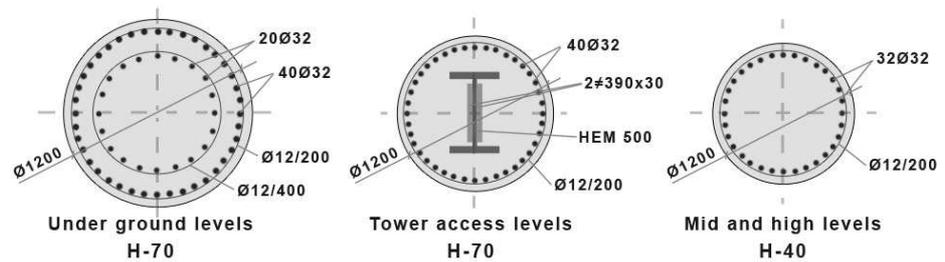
Typical columns cross-sections: below grade, tower access areas and mid and high levels.
